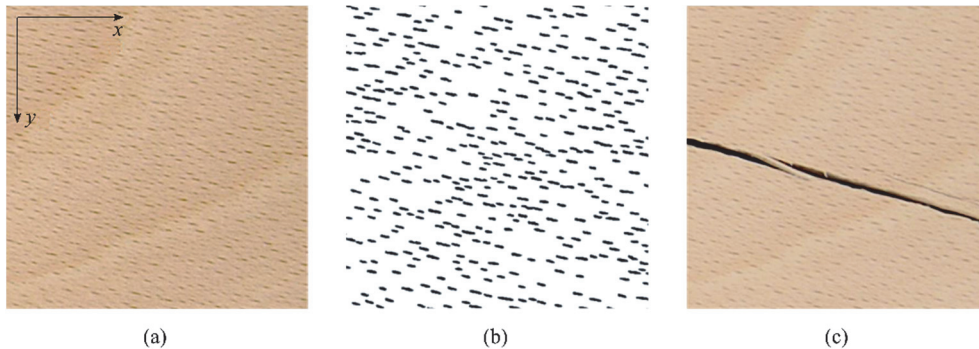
Detail image of a segment of board no. 2058, with the spindles formed by the medullary rays running mostly at an angle of 15° to the longitudinal axis of the board (a), identified objects (b) and fracture path in the same segment (c). This board exhibited a tensile strength of 42 MPa in the tensile test to failure.
